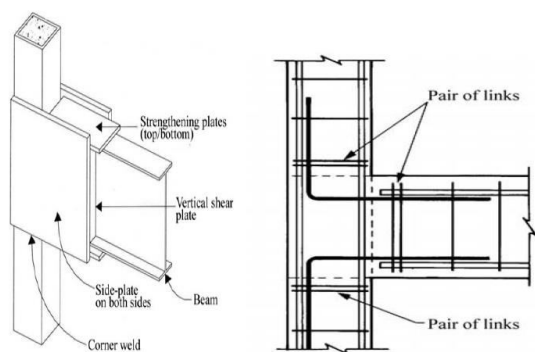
Enhanced beam-to-column connection details for steelwork and reinforced concrete
